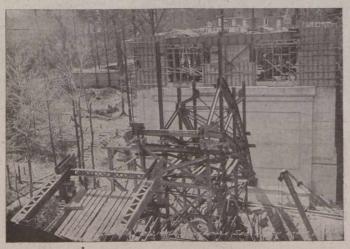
Rosedale Section, View of Arch Under Construction. Photo Taken from Pier H.
